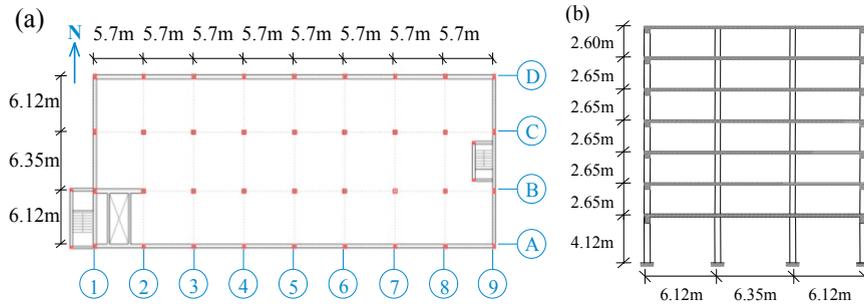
Van Nuys Building: (a) planar view and (b) transverse section
